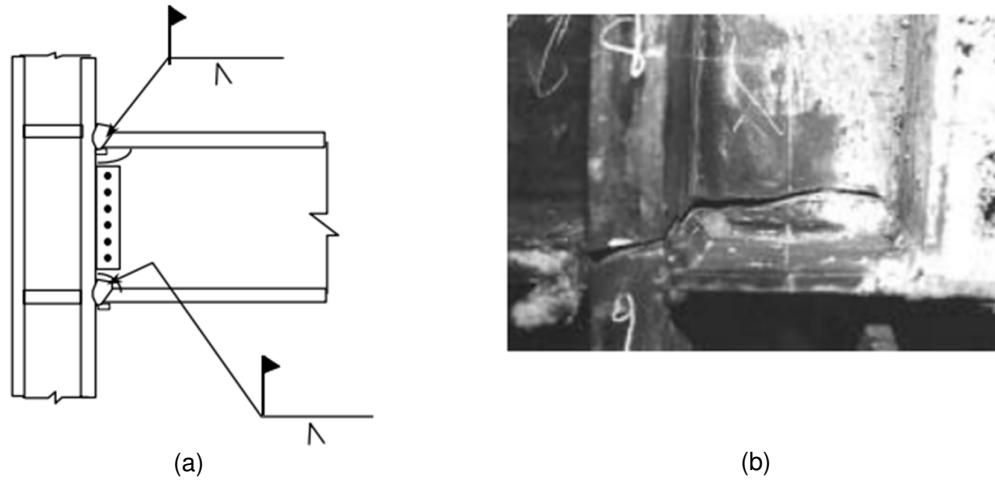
Pre-Northridge; (a) Typical welded moment-resisting connection (b) Fracture in column web (FEMA-355D, 2000)
